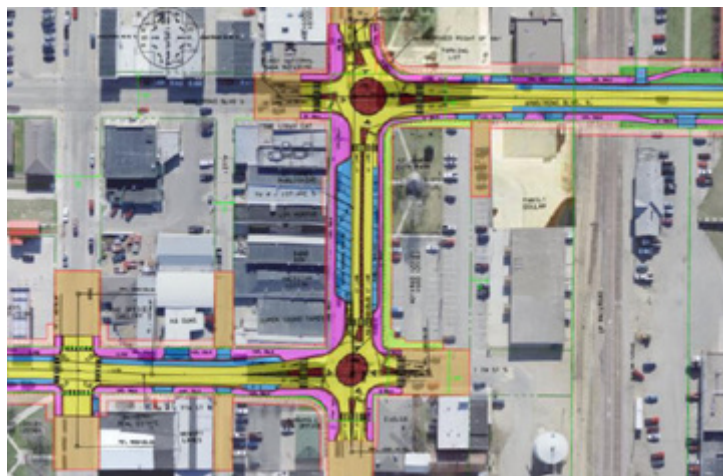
The reconstruction layout for Highway 4 in St. James, Minnesota, shows the future location of the mini-roundabouts. Credit: MN DOT
